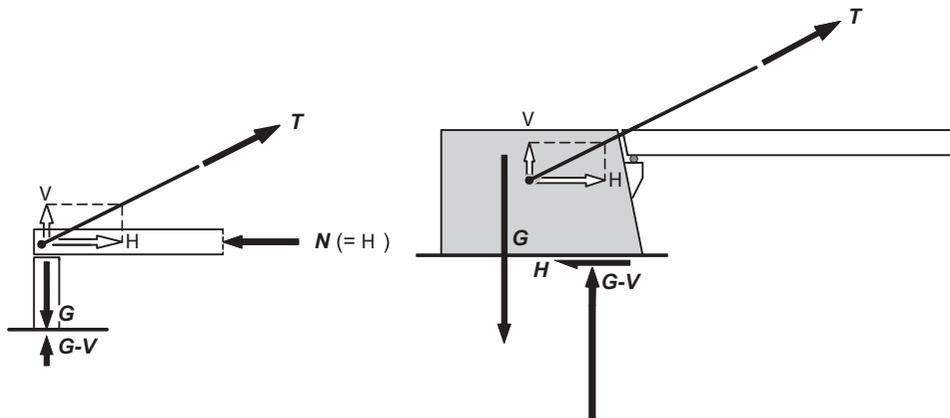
Connection between the side span cable and the anchor pier/block in a self-anchored system (left), and in an earth-anchored system (right)
